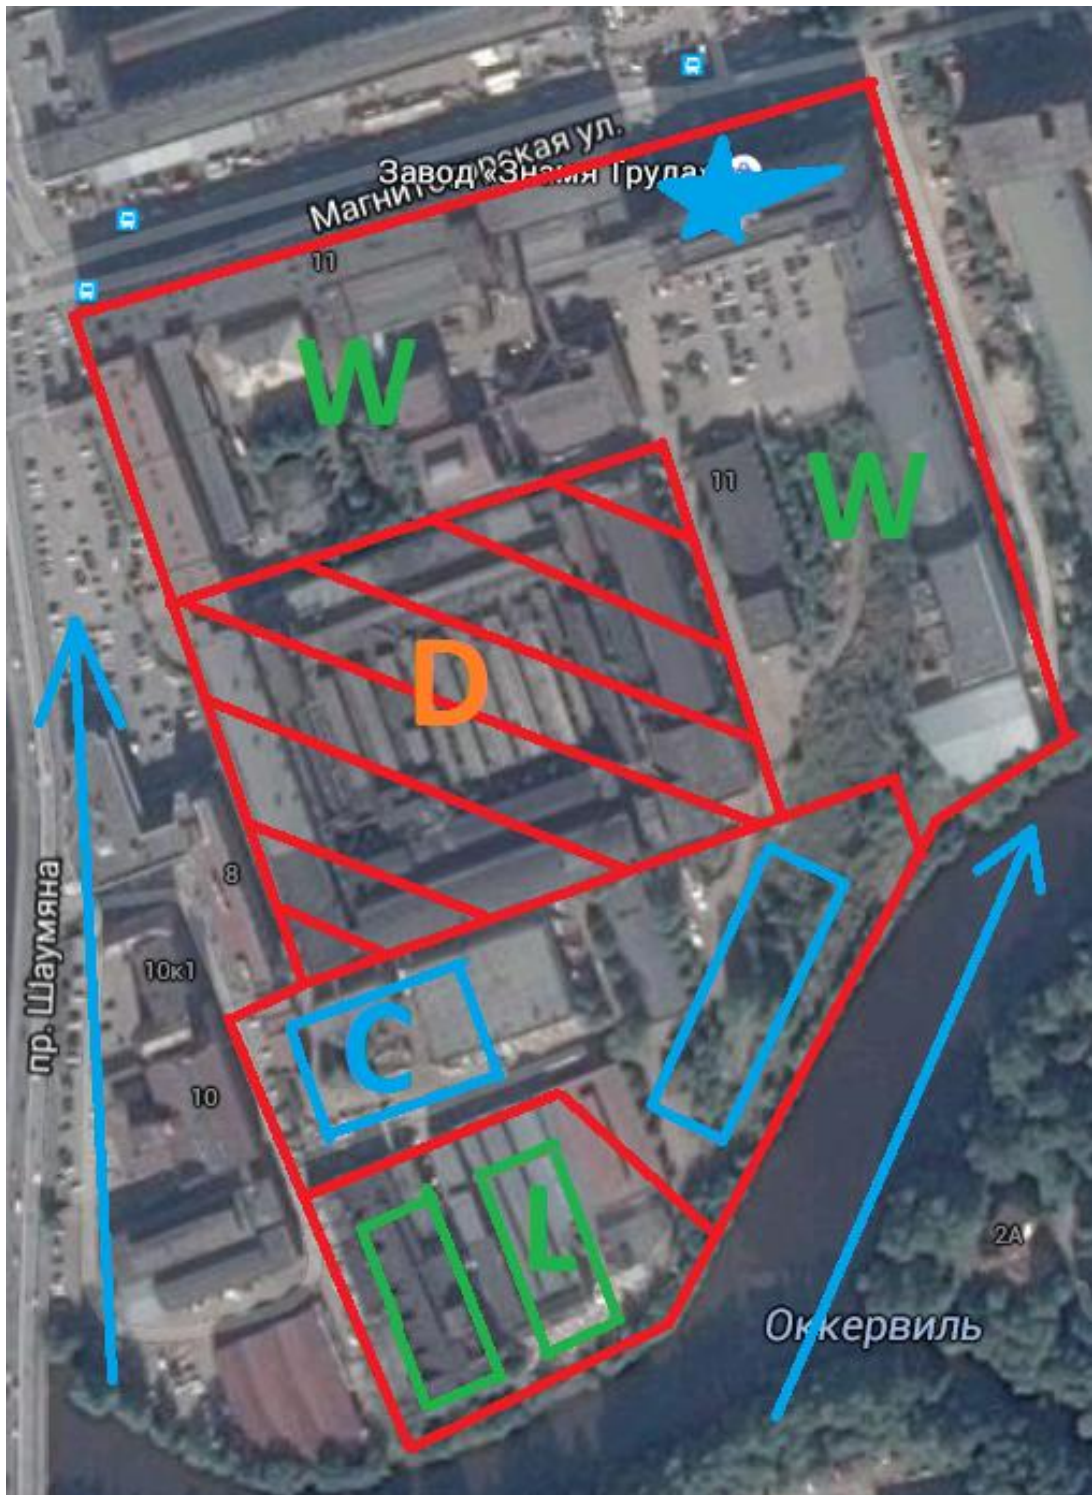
Preliminary a scheme of construction site after finishing of the first construction order.
